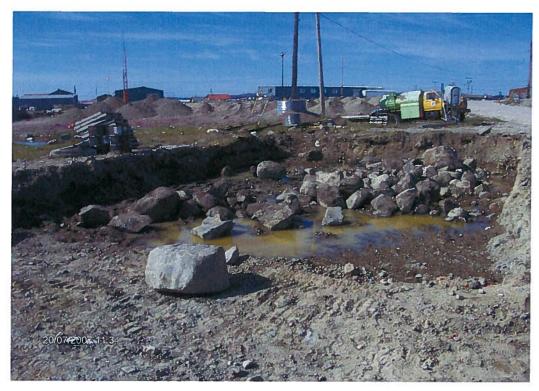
View of the Vertical Tank excavation. Photo taken facing west.
